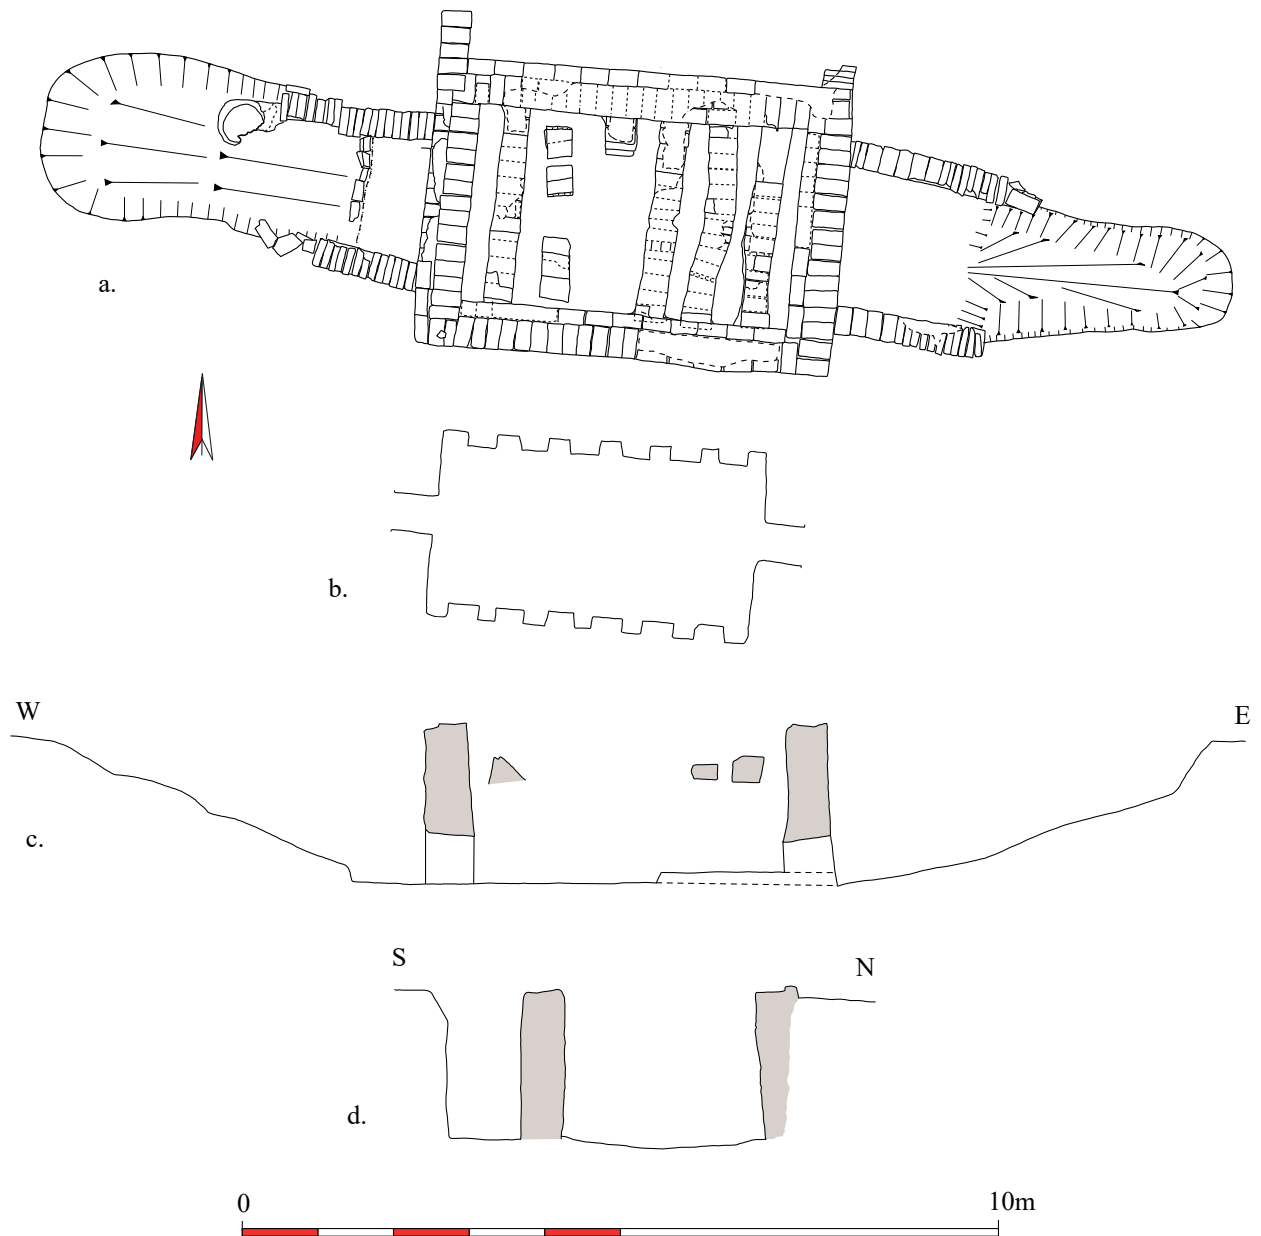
Building F7. The southern kiln. a. top plan; b. plan of the floor of the furnace chamber; c. east-west section; d. north-south section (scale 1:100).
